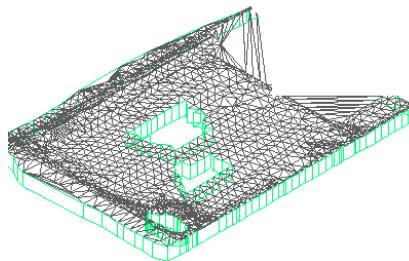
A surface border projected to the datum in 3D view
